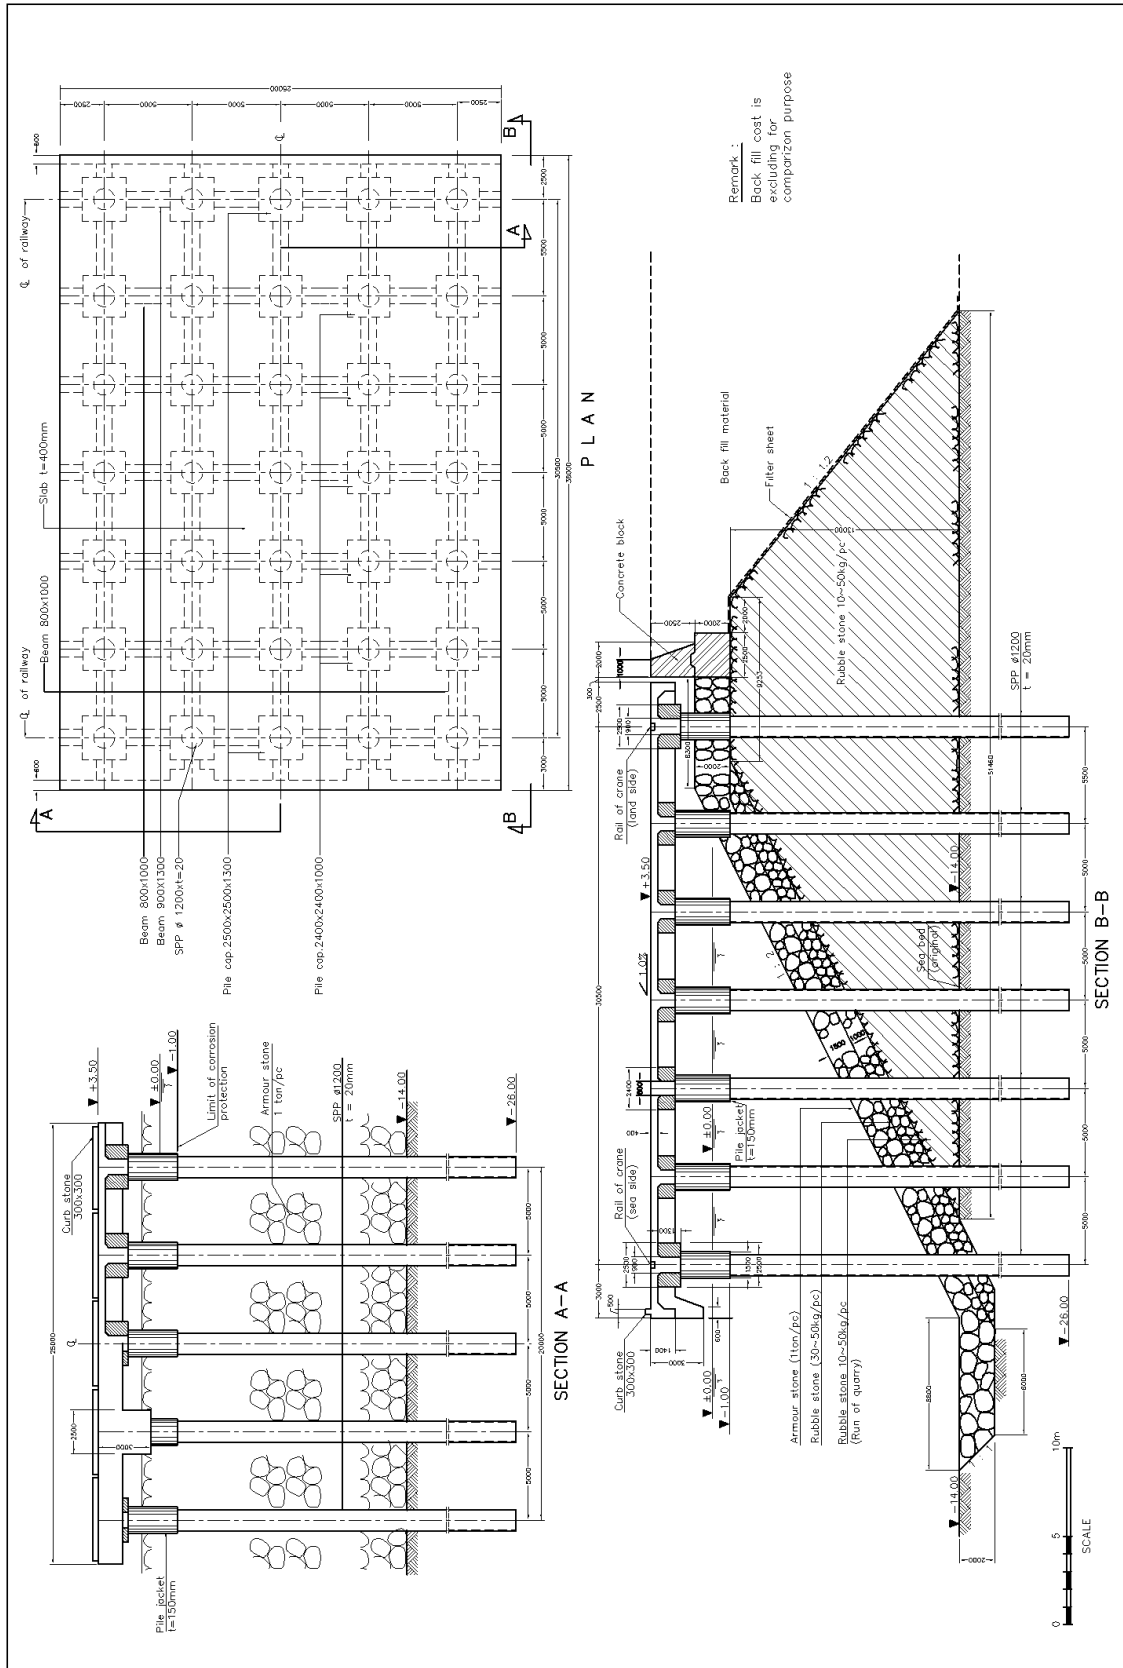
F-10 Typical Section of Steel Pipe Pile (SPP) Type Quaywall Retaining Wall Design for Redevelopment of Existing Port Facilities Area
